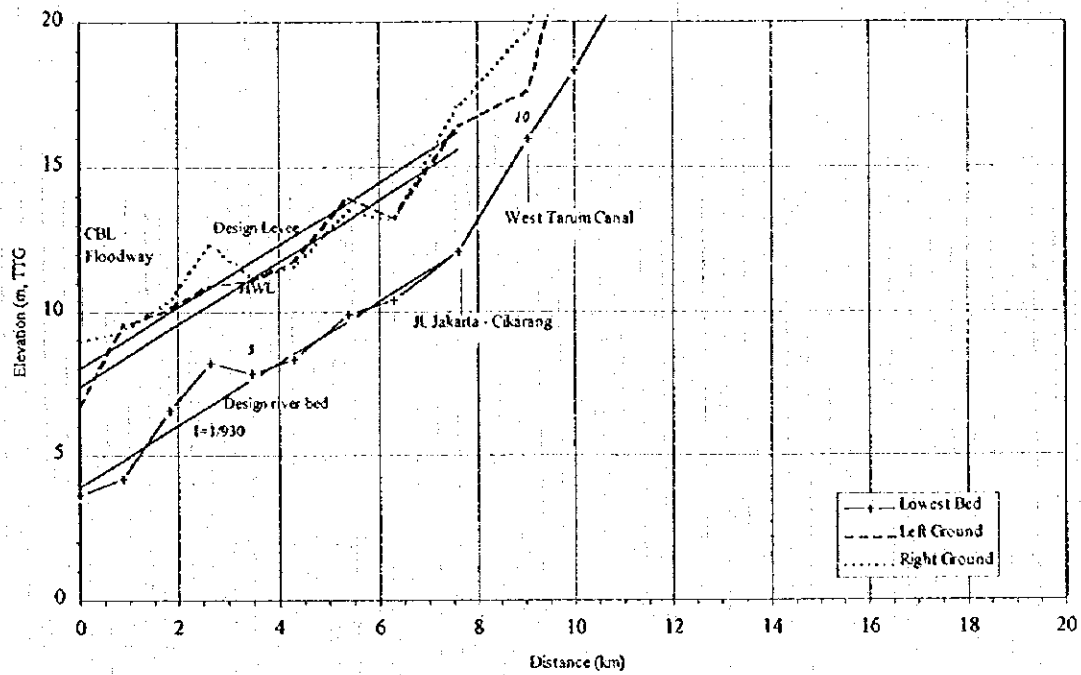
PROPOSED LONGITUDINAL PROFILE AND CROSS SECTION (12/13)
